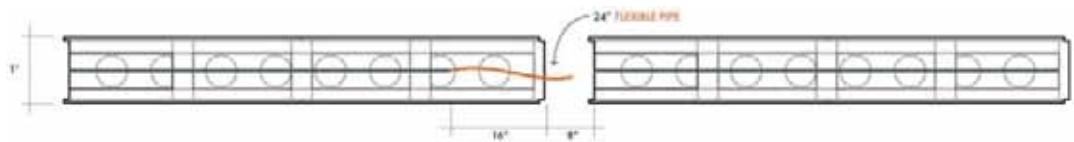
Edge to face *Fin Wall Panel* connection: Unit *Fin Wall Panel* to Corridor *Fin Wall Panel*. Source: (Author 2013)
